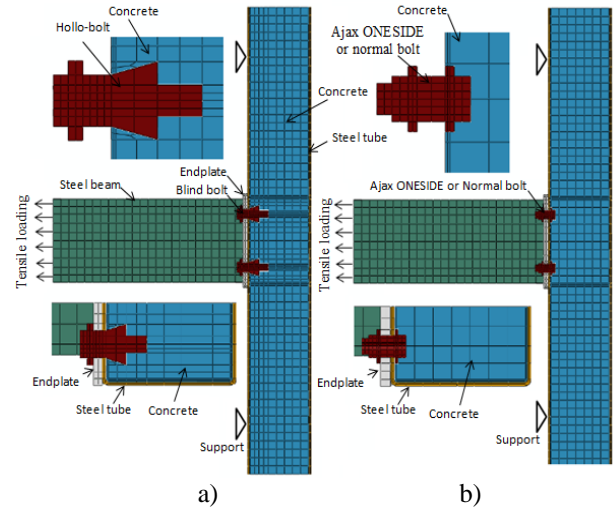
FE model of steel beam-CFST column joints in tension with: a) blind-bolted (Hollo-bolt) connection, b) Ajax ONESIDE or normal bolted connection
